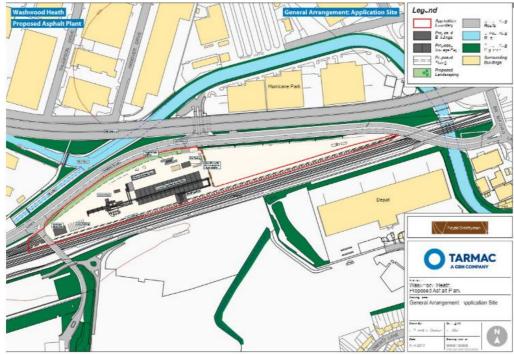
Layout plan for application reference 2017/04513/PA located to the north of the Network Rail tracks and the Washwood Heath Depot site.
